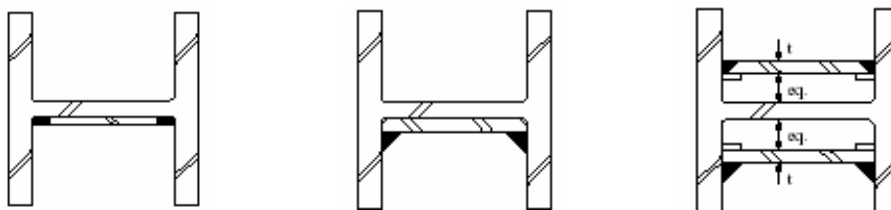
Typical web doubler plates: single plate with groove (*left*) or fillet (*middle*) welds and pair of equal thickness plates with groove or fillet welds (*right*).
